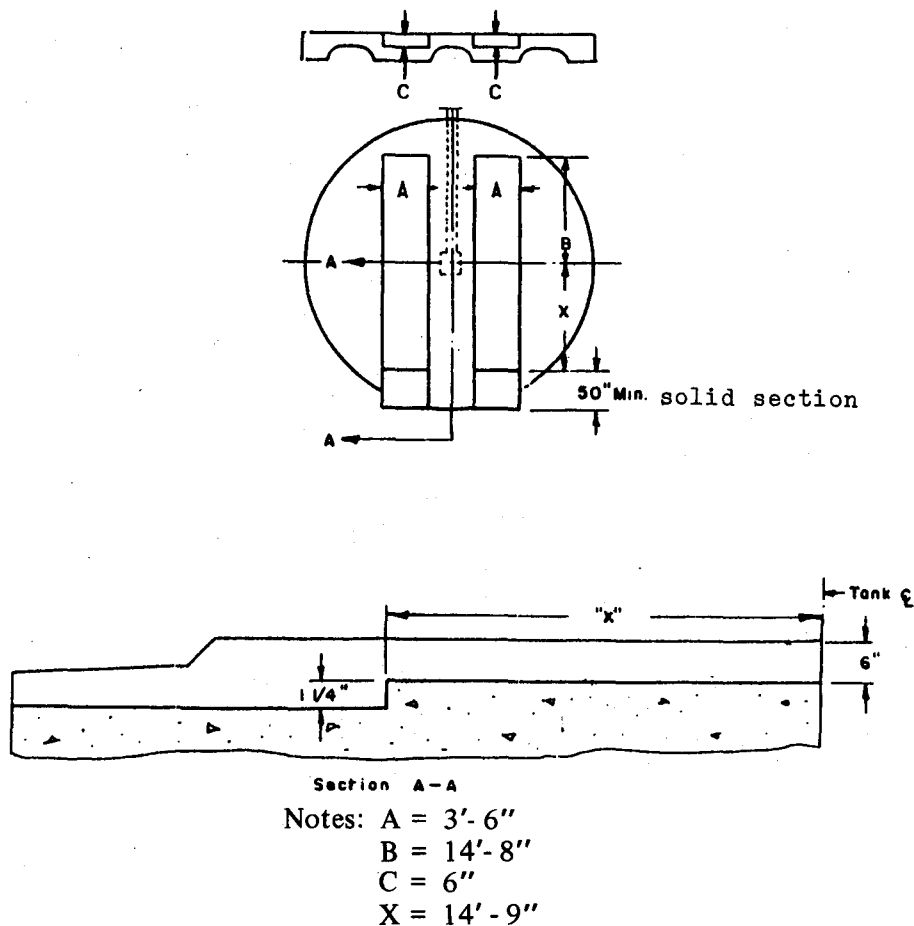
Aeration duct design for the flush concrete floor of 40-foot diameter by 40-foot eave height steel tank.
